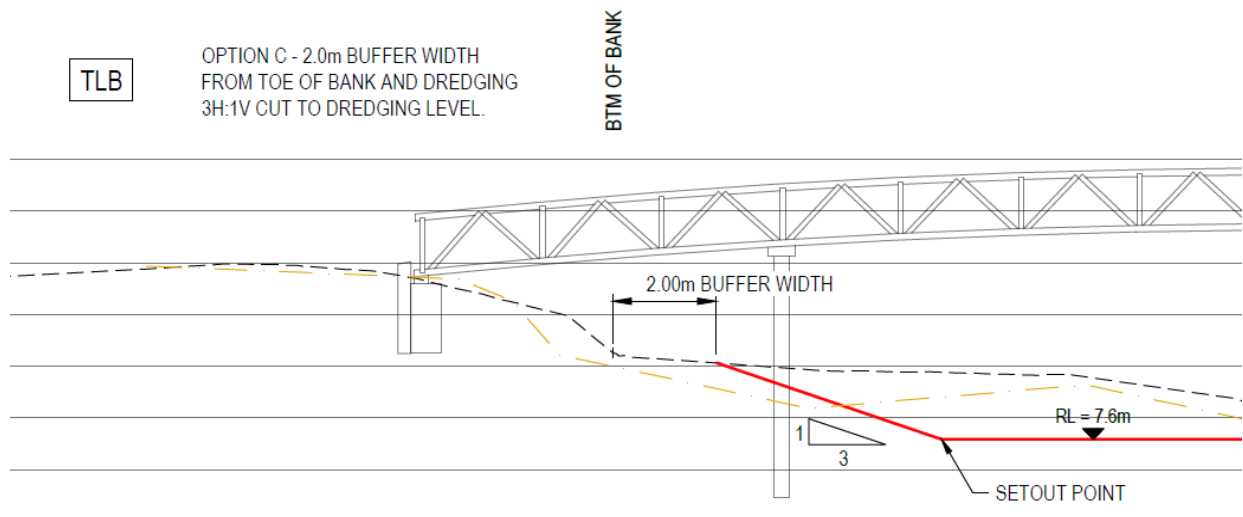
Typical Section of Buffer Zone Option to Existing Structures
